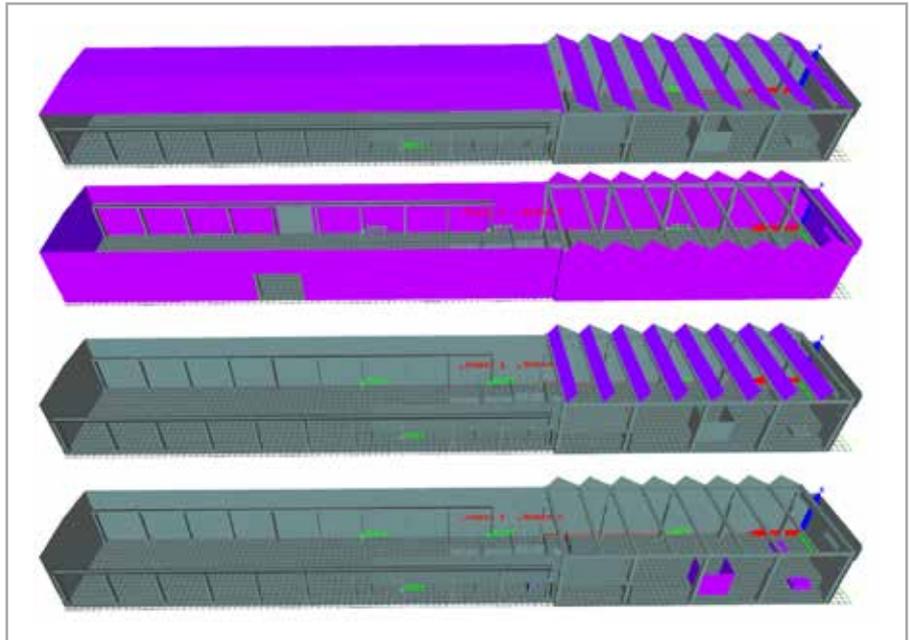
Definition of work environment or machining shop/floor and materials: insulating panels, PVC tarpaulins, beams, roofing, flooring, walls, ceiling, windows, tables and partitions, and openings to the outside. mechanical workshop being studied
